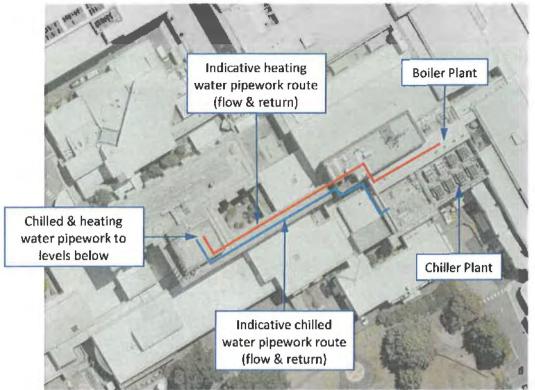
Proposed Chiller & Heating Water Pipework Route
